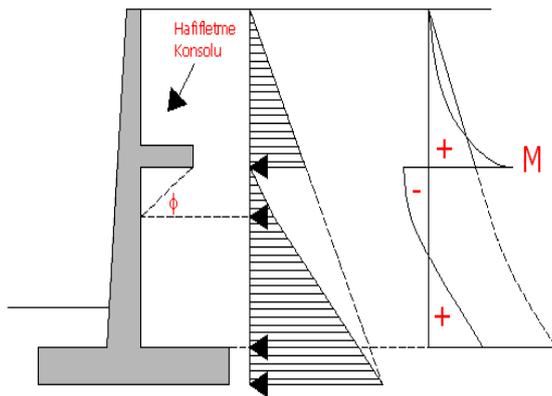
a. Proportionally-Sized Stem-Stepped Wall
